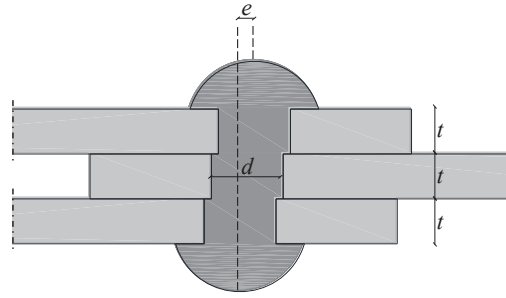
Relevant geometrical parameters for the investigated rivets in presence of constructional defects.
